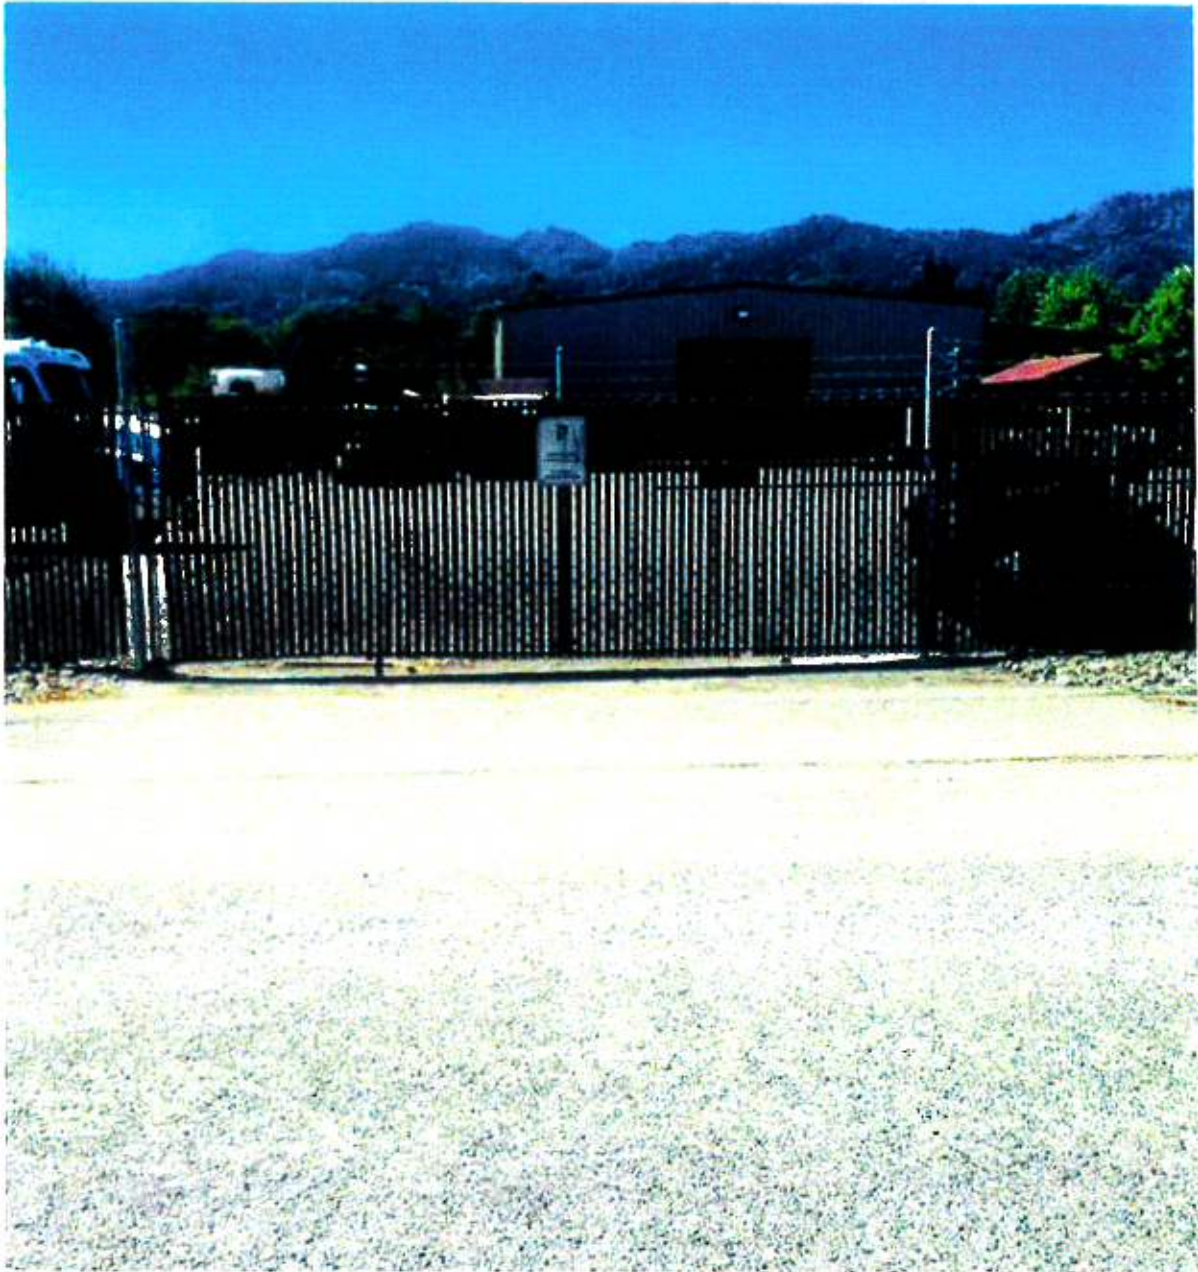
21' Gate Opening w Highway access to Taylor Way
